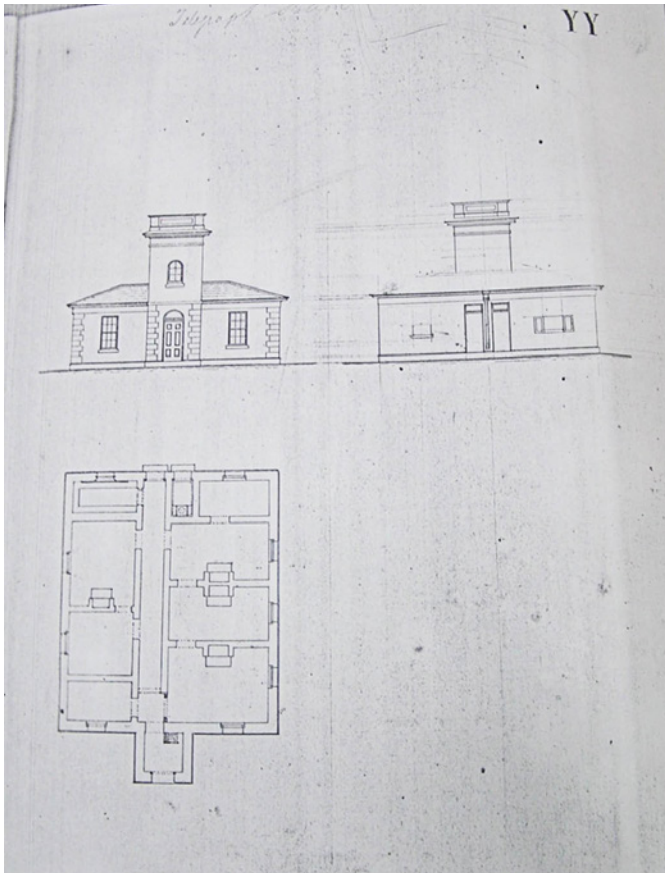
Geelong Telegraph Station, Floor Plan & Elevation Drawings, c.1857. Source: Book of Plans by Clerk of Works, Henry Ginn, VPRS 4107/P1 Unit 1, Public Record Office Victoria.
